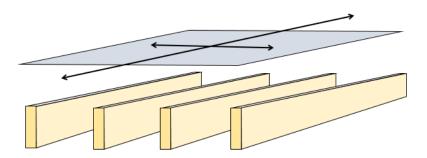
Longitudinal and transversal stiffness of a joist floor.
